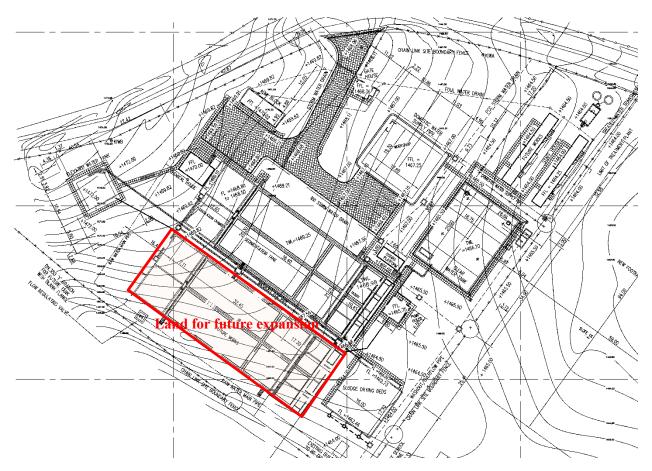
Kiawambeu WTP Plan Drawing and the Future Expansion Area
